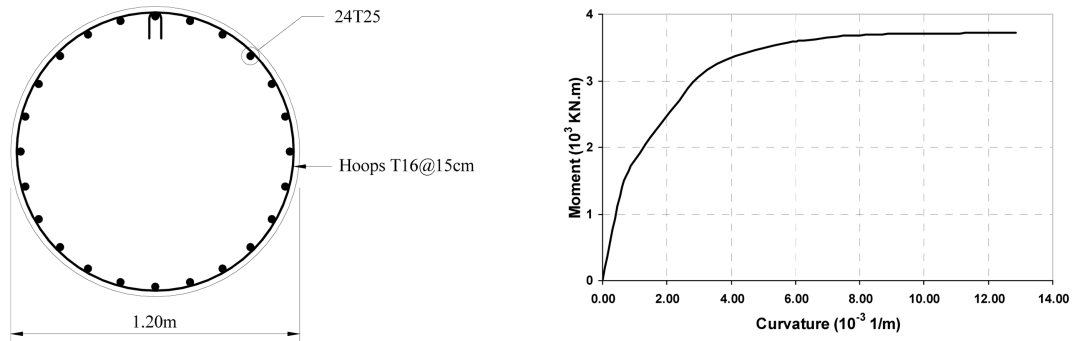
(a) Cross section and its moment curvature curve for the bridge pier (Sample bridge 1)
